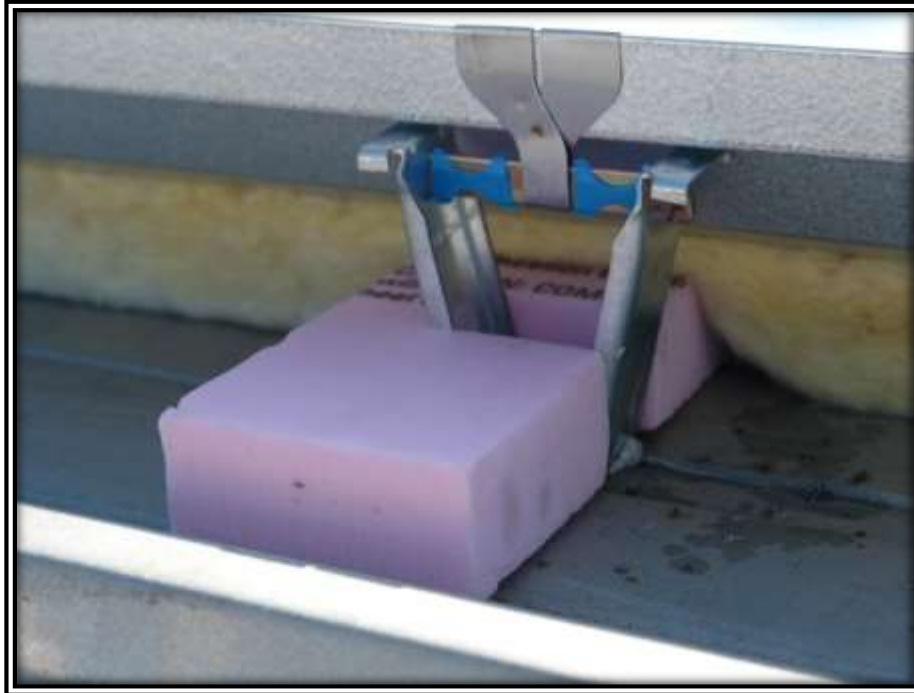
Photo M: Tall clips are being used to raise the height of the roof panel so that a layer of insulation can be installed.
